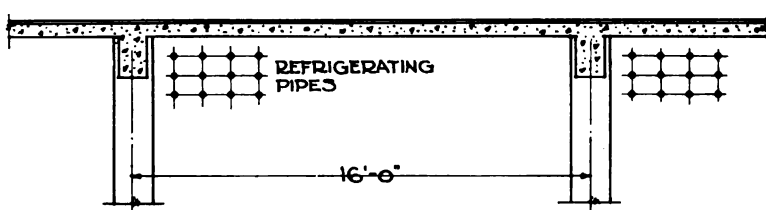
SECTION OF FLOOR WITH GUTTER CONSTRUCTION.
